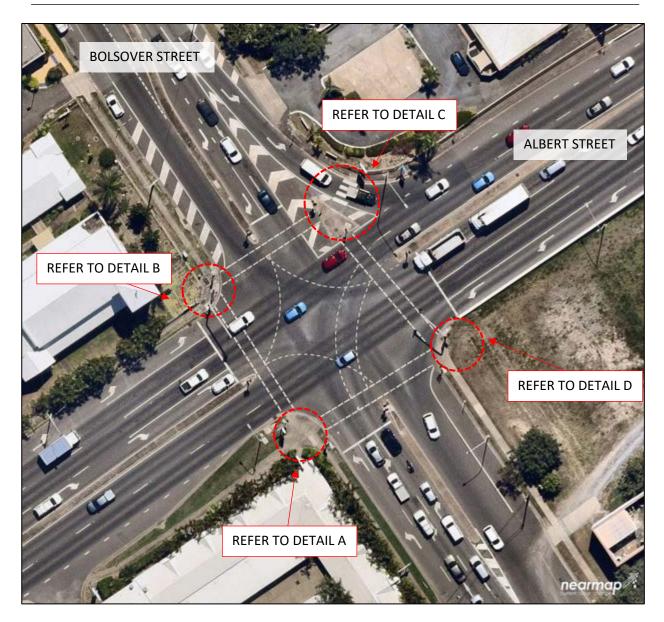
AERIAL OF THE ALBERT STREET / BOLSOVER STREET INTERSECTION
